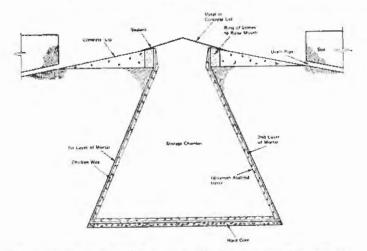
Cross-section of ferrocement lined underground storage pit.
